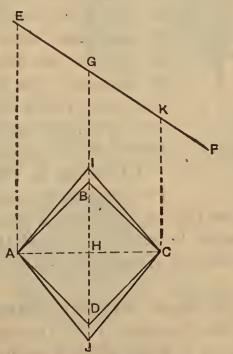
To Lay Out the Roof-hole for a Chimney.
